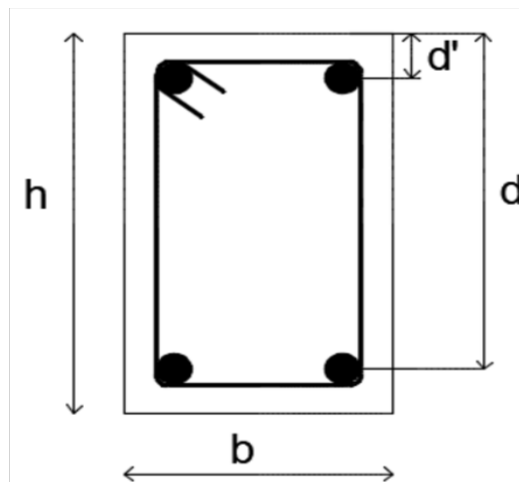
Example of transversal beam section with longitudinal reinforcements
